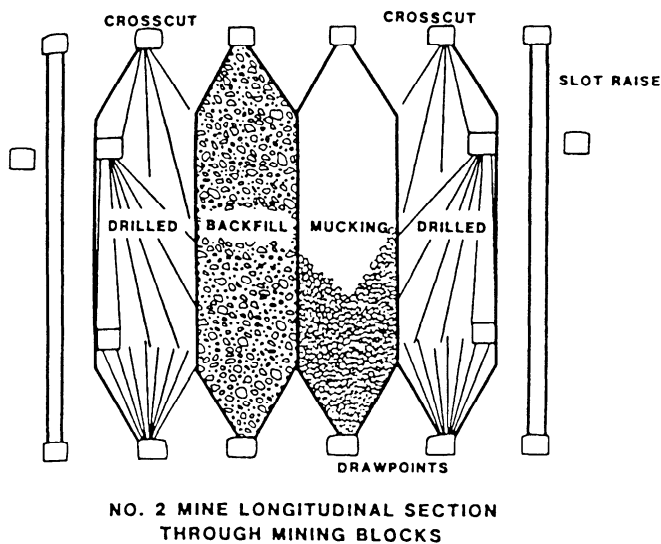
Cemented backfill used as alternative to pillars (Belford, 1981).
